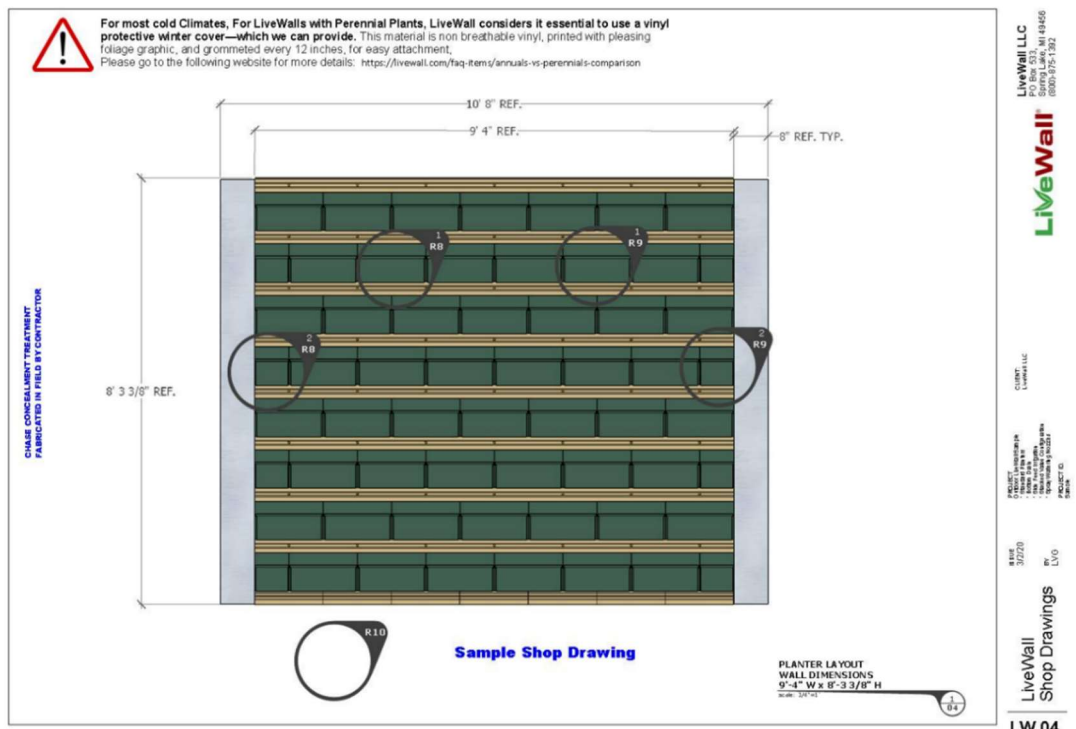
LiveWall Shop Drawing: Planter Layout
